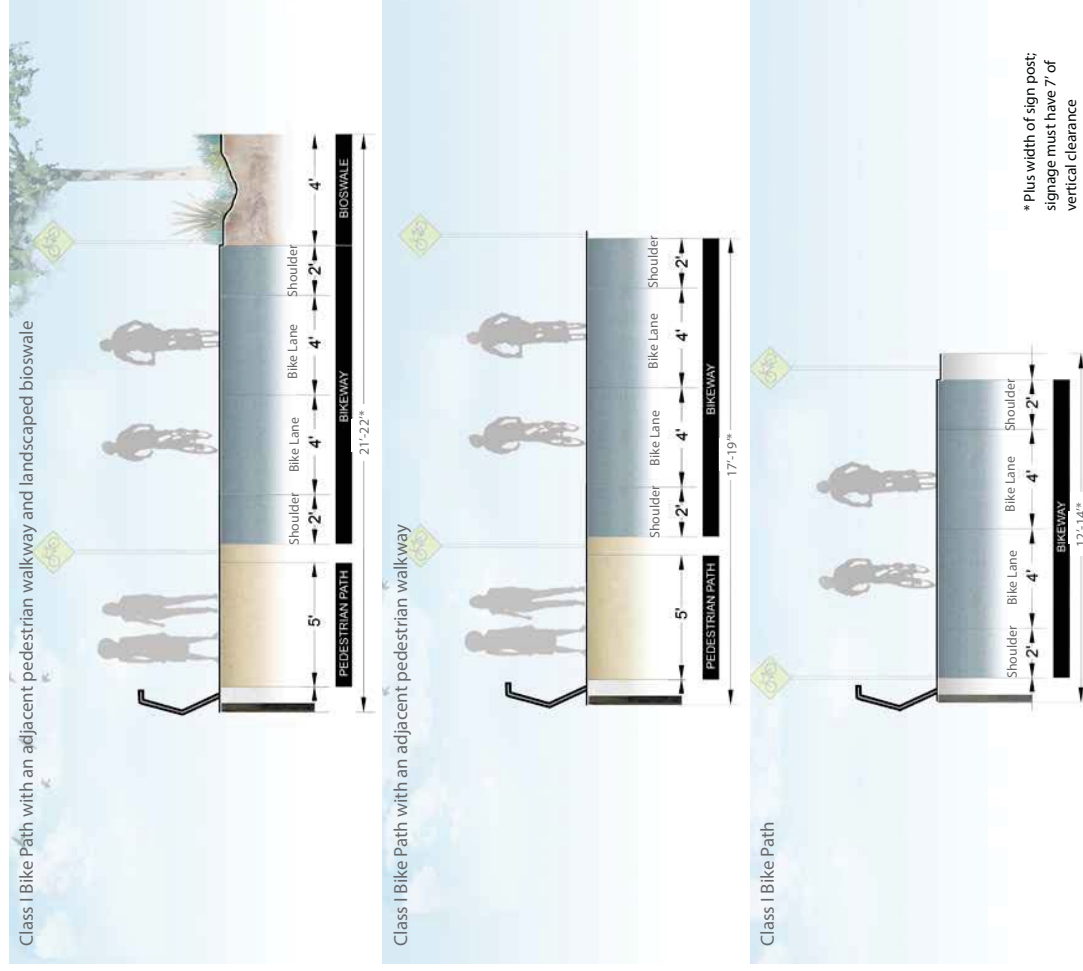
Typical Bikeway and Greenway Cross Sections
